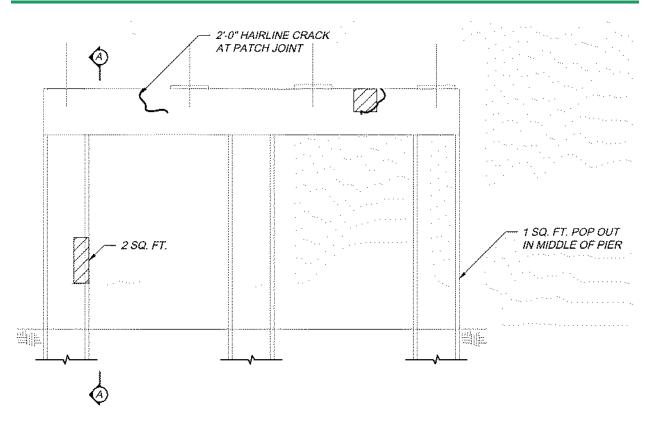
Location of Proposed Concrete Repairs - Pier 1 Downstation (North) Face Elevation MP 182.1
